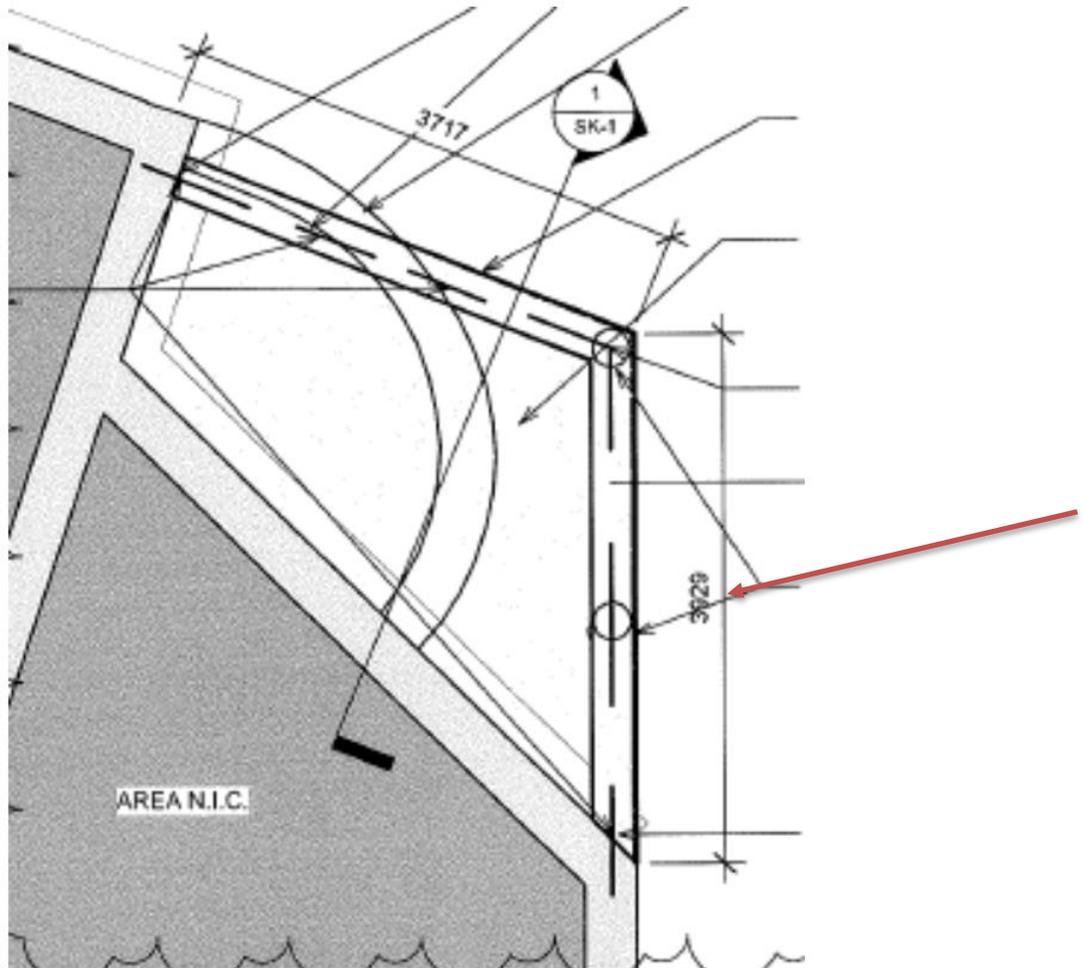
Excerpt from Drawing A100 Foundation Plan at new addition
